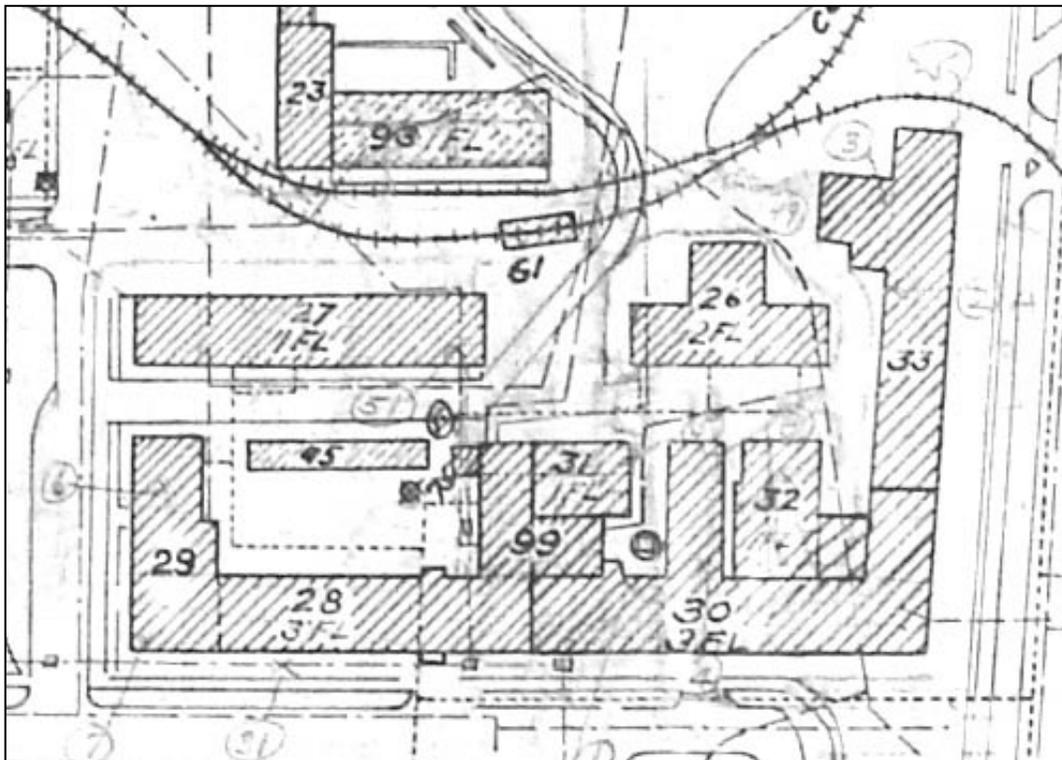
Detail of Building 27 from Buildings and Grounds, Hill Shops, Springfield Armory, March 11, 1918 (fig. 39).
